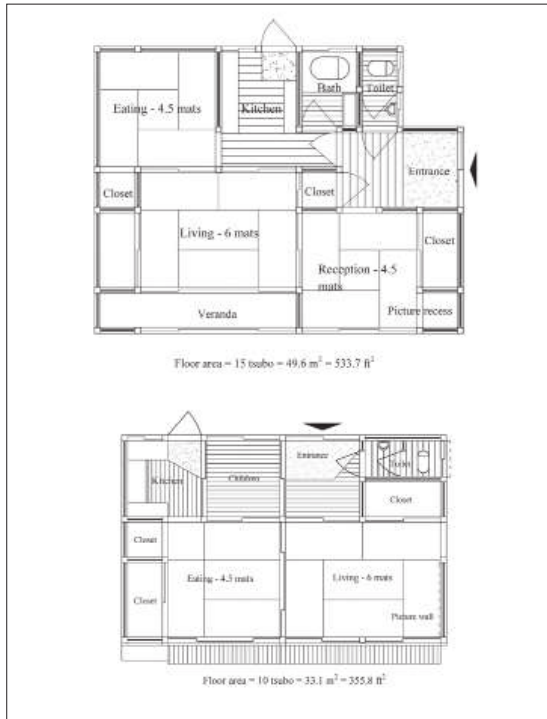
Examples of typical interior corridor type (nakarōka gata) plan. First appearing in the early 1900s, this plan continued to be used in typical middle class houses throughout the Showa period (Source: Reproduced by the author from Engel, 1964).
